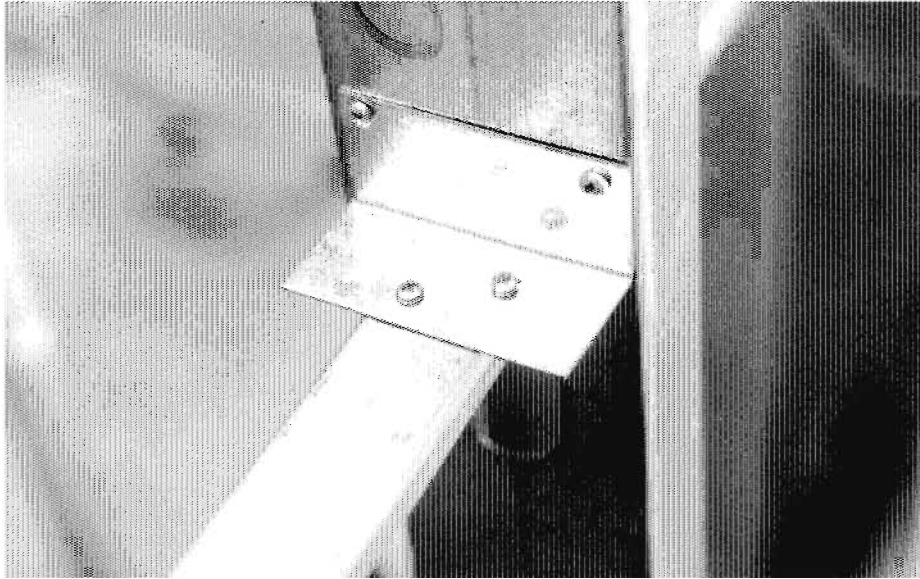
THROUGH-THE-WEB CLIP ANGLE ATTACHMENT DETAIL
